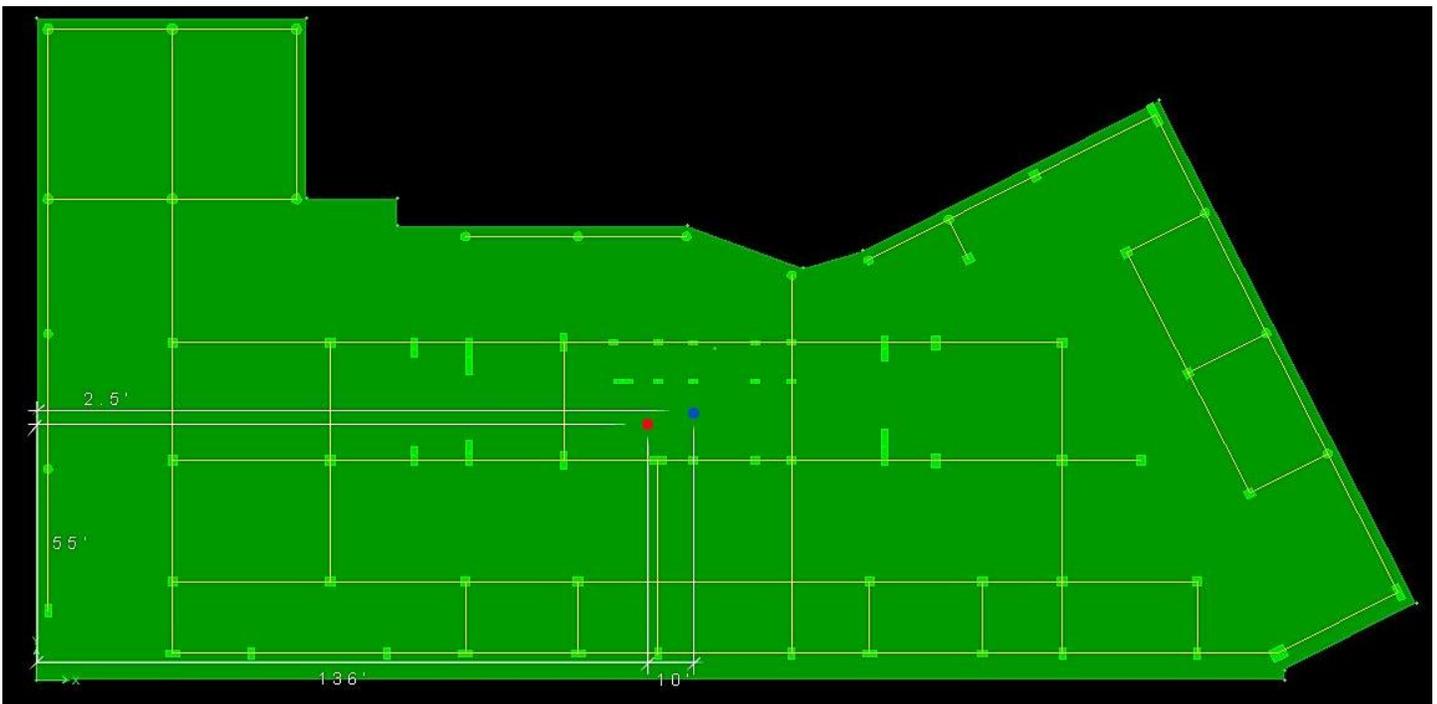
Plan view showing the location of the Center of Mass (blue dot) and the Center of Rigidity (red dot)
